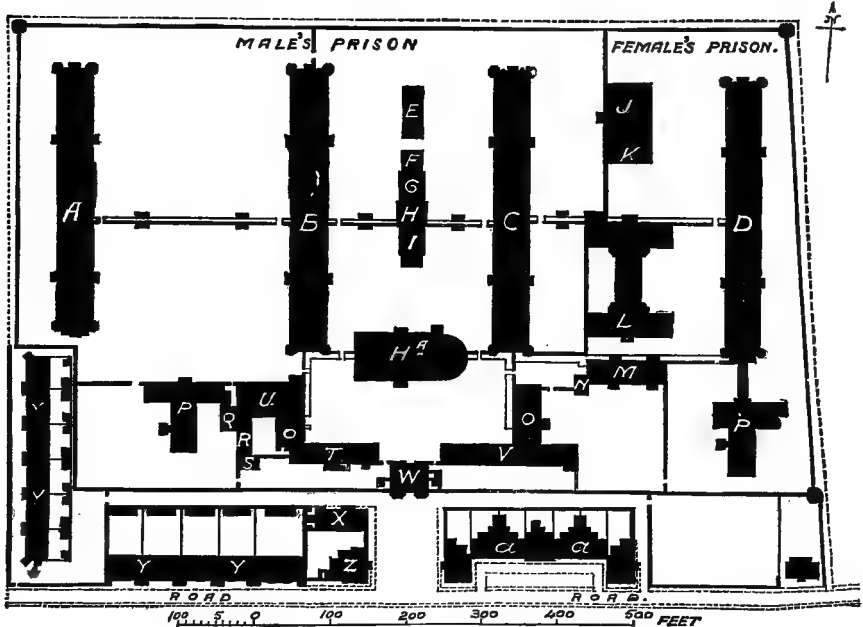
Block Plan of Wormwood Scrubs Prison.
